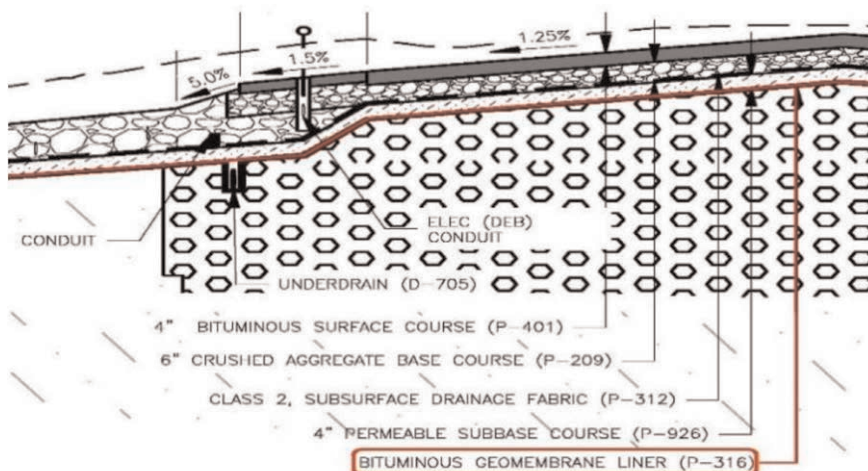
Cross-section adopted for the reconstruction under the layer of asphalt concrete.
